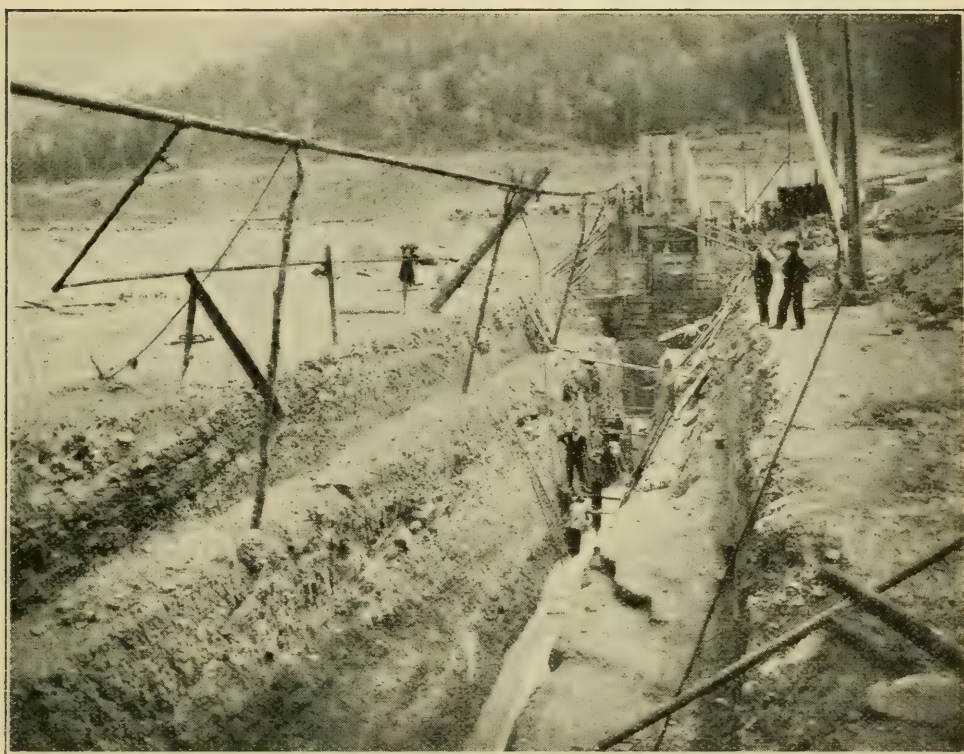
WESTERN SECTION OF CORE-WALL DITCH, HINCKSTON RUN DAM.
